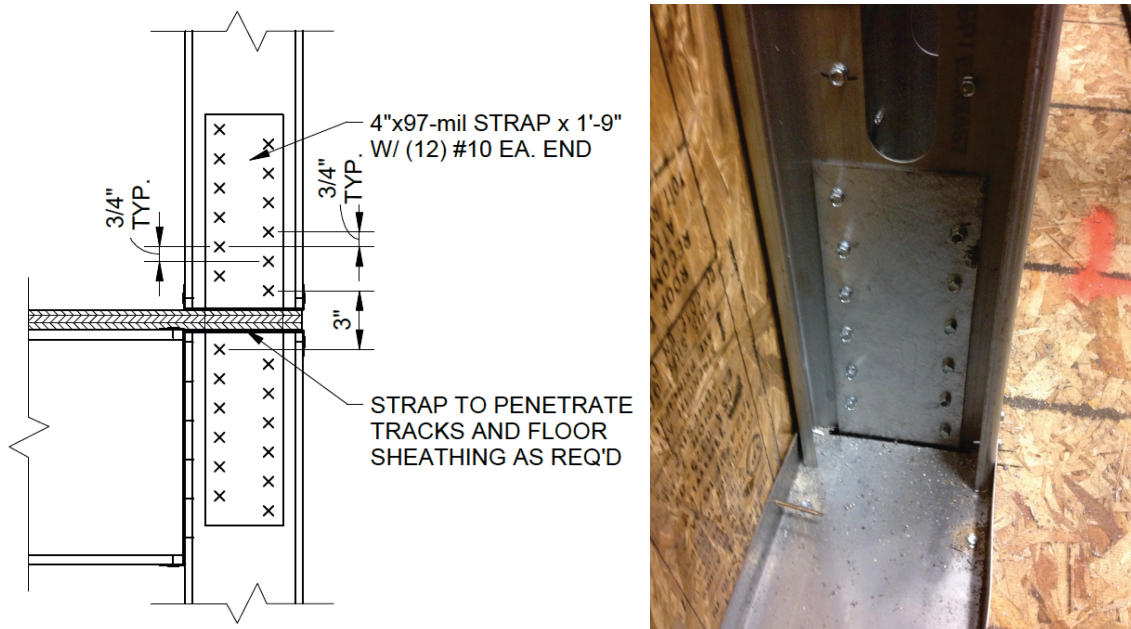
Shear wall tie detail from building specimen construction drawings (Peterman 2014)
